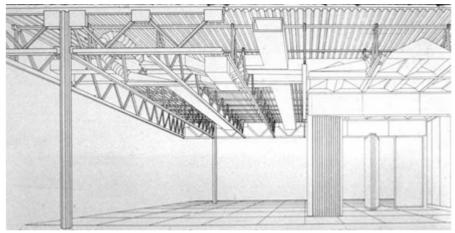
Trussed beam solution [http://www.corusconstruction.com]
